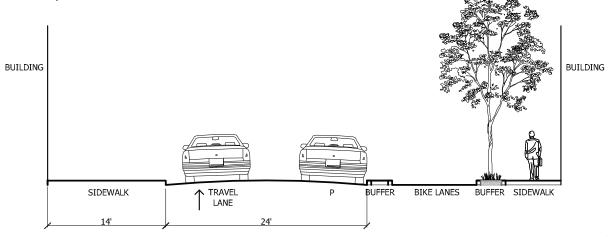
Possible Configuration for Smith Street between Sigourney Street and Bay Street
